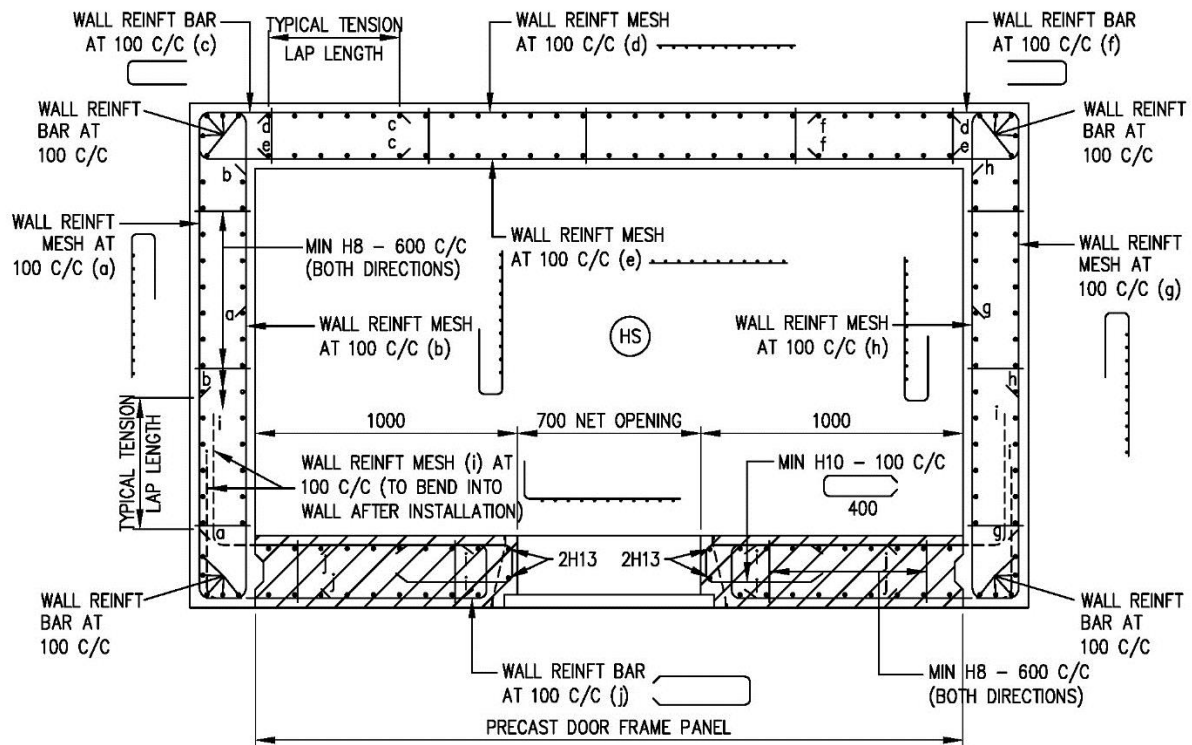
PLAN OF PRECAST HS, SS or SSS DOOR FRAME (TYPE 3)
